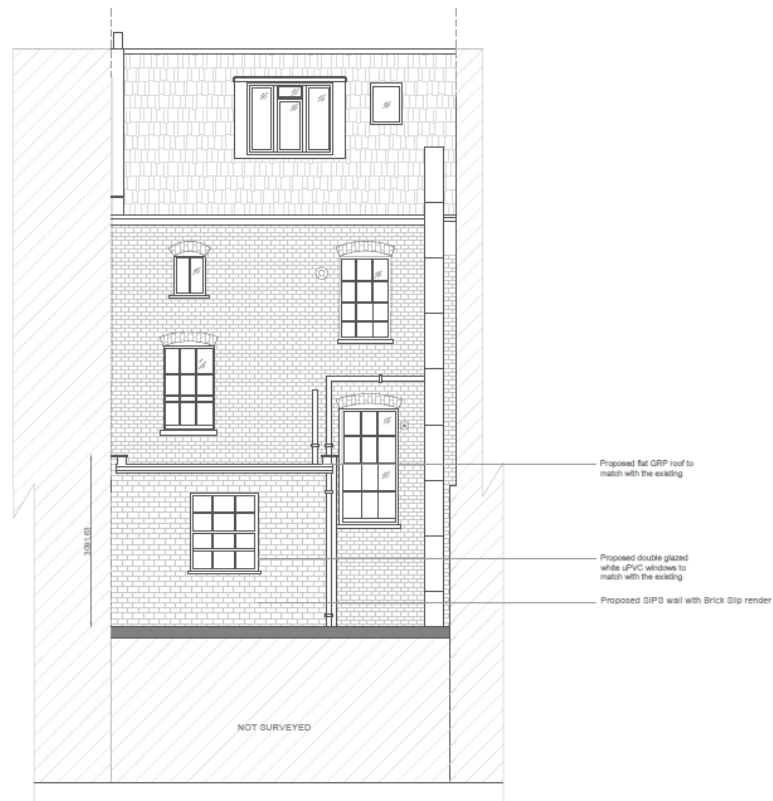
Previously approved and proposed rear elevation (no detail changes)
